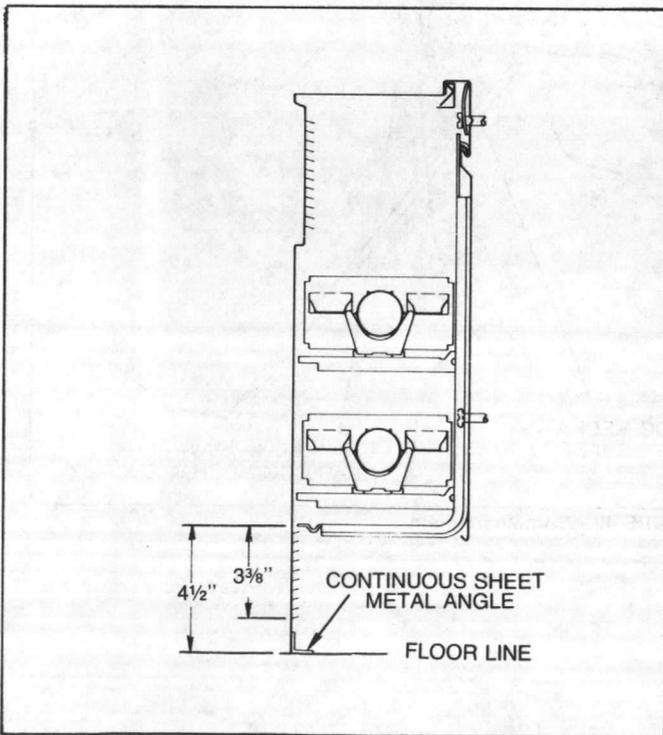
Front Inlet Enclosure with Sheet Metal Angle
